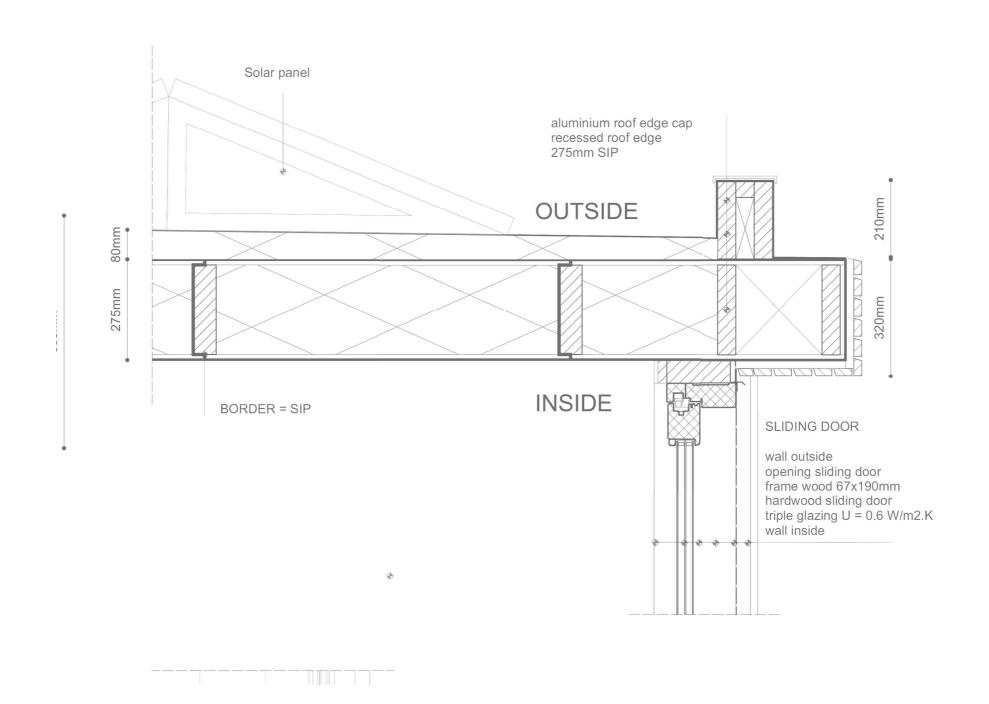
10VERTICAL SECTION OF EXTENSION
